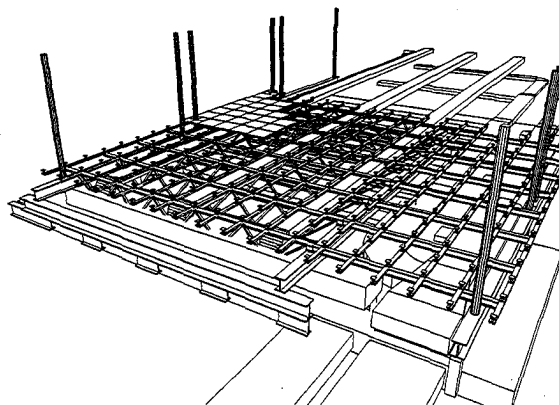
CBPD-IW: Identification of spatial conflict between the structural floor system and the HVAC ductwork through CAD modeling
